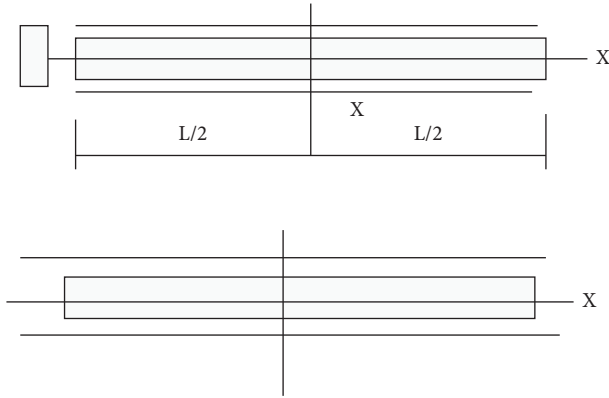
Schematic diagram of load transfer of steel tubular concrete and surrounding constraints of the large cross-sea bridge.
